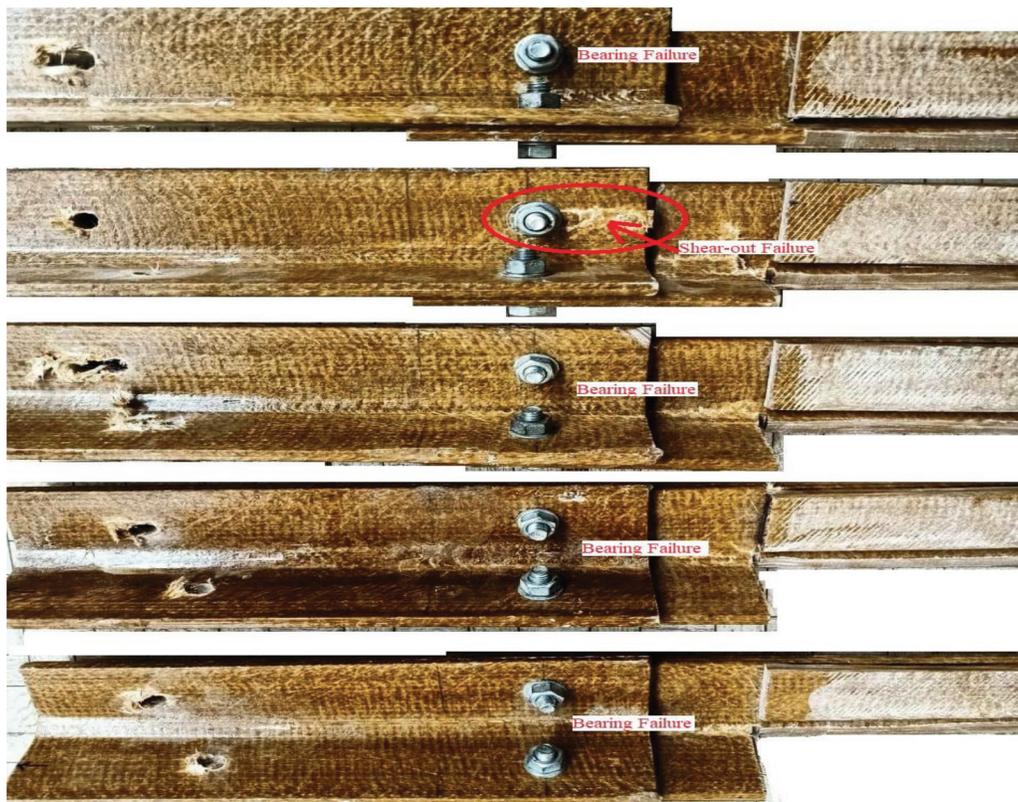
Angle-to-angle hybrid connection (epoxy) tested specimen.
